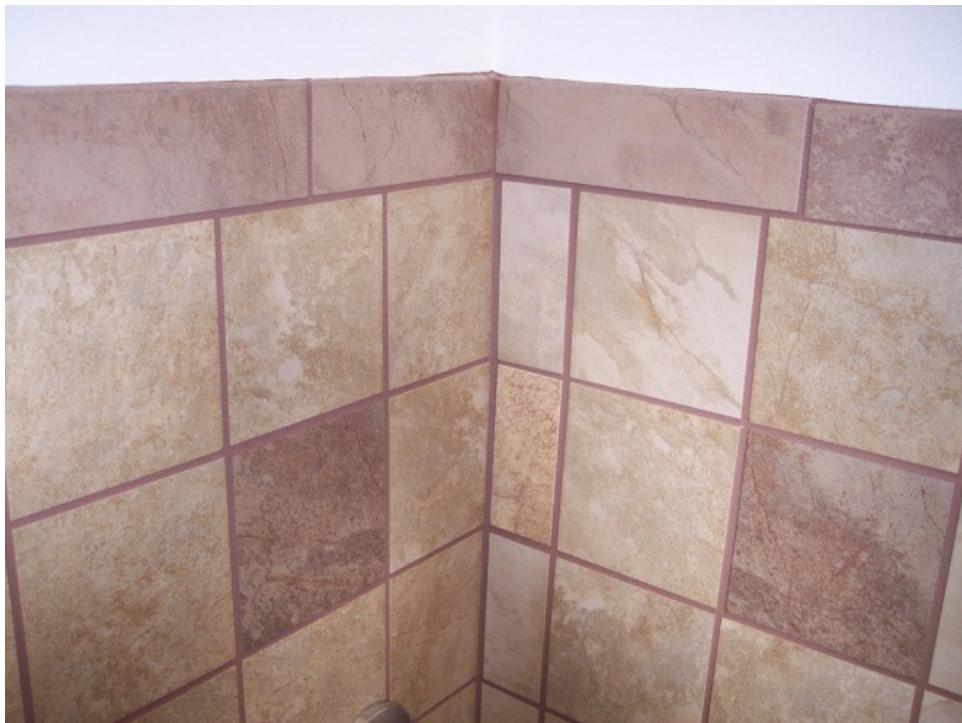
VHW New porcelain wall tile in remodeled bathrooms
